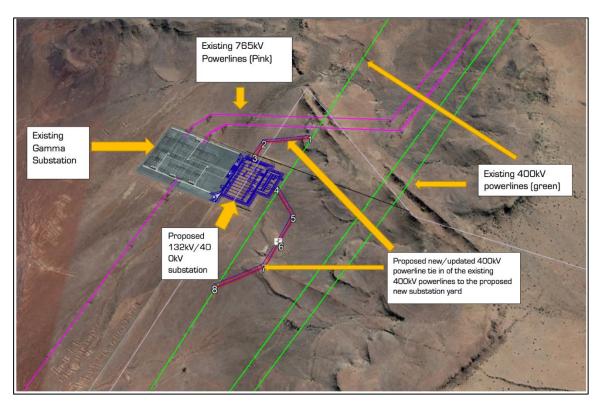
Proposed Updated Layout depicting the existing Gamma Substation with the next phase of the authorised development now proposed for implementation (new proposed 132kV/400kV Substation yard and new reconfigured turn-in and turn-out of the existing 400kV powerline).
